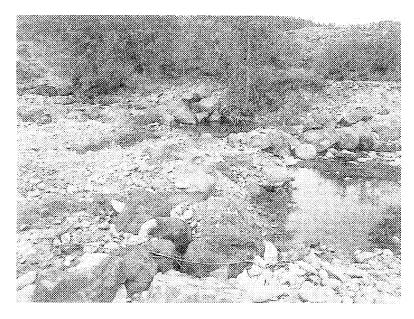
Reconstructed lowermost rock structure at the Featherville Culvert project.
